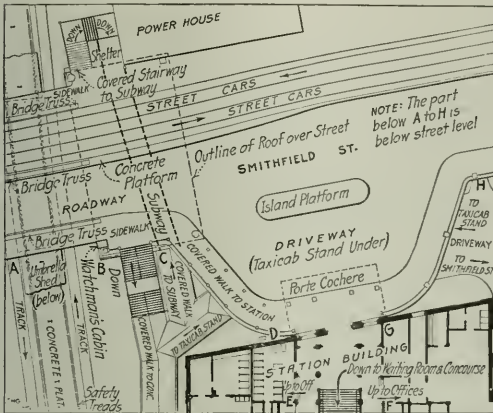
PLAN OF STREET SHELTER, COVERED WAY AND SUEWAY FOR PASSENGERS; PITTSBURGH & LAKE ERIE R.R. TERMINAL STATION, PITTSBURGH, PA.
